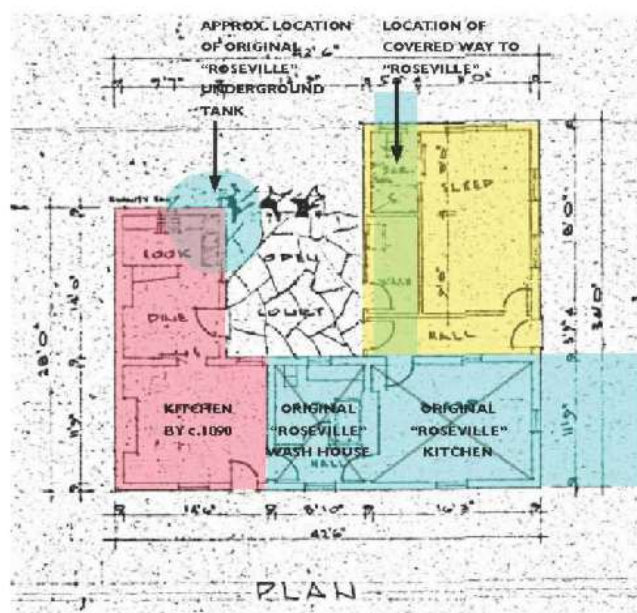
No. 21 Whistler Street as depicted in the 1967 plans for alterations and additions to the building. Blue = structures constructed by Thomas Rowe as a part of "Roseville" as shown on the 1883 auction notice at Figure 4.1. Red = structures added by c. 1890 as shown on the MWS&DB Manly Detail Sheet 29 and in the Kerry & Co photograph at Figure 4.2. Yellow = additions proposed in 1967.
